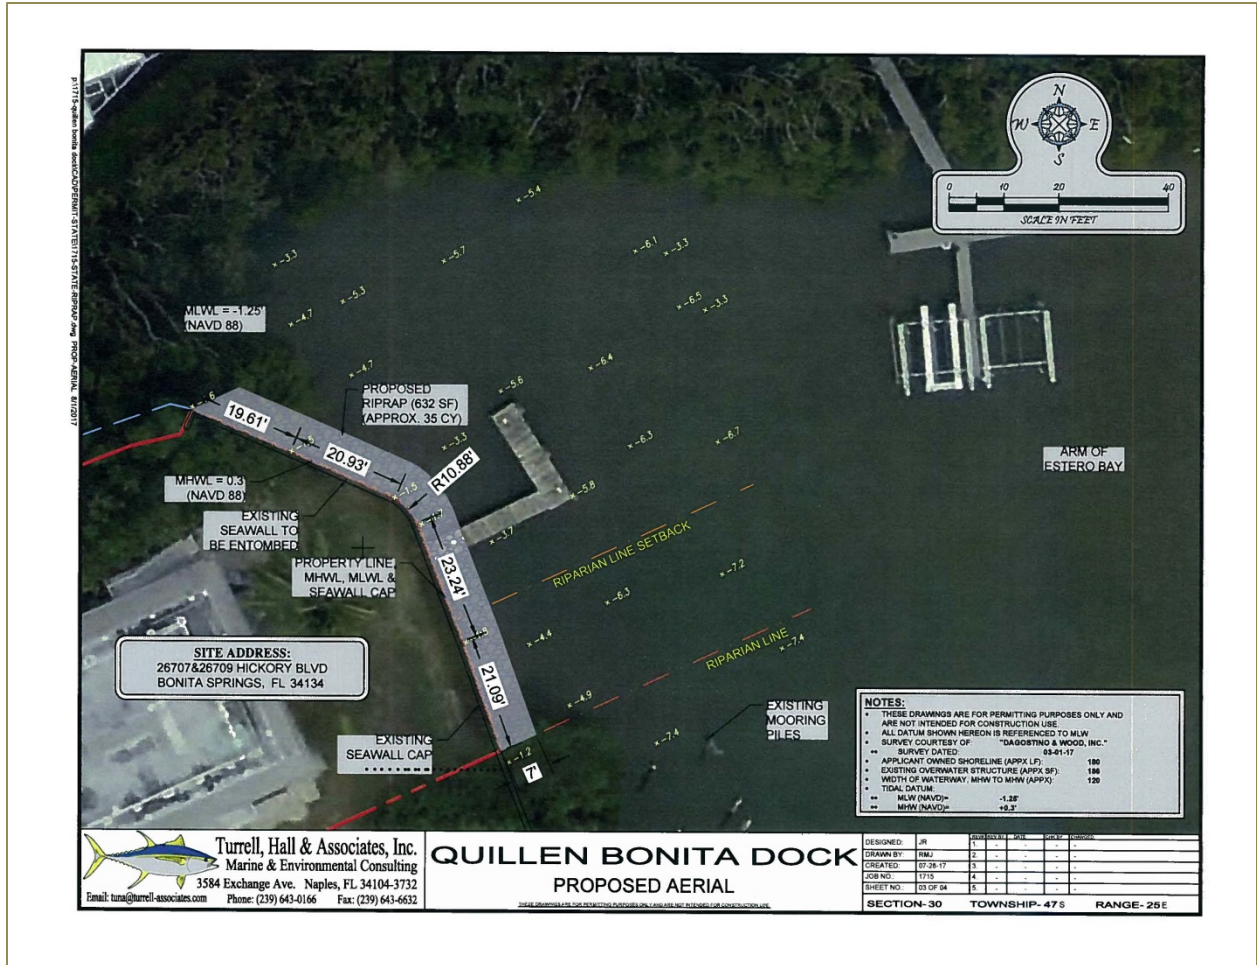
Proposed riprap revetment site plan (©2017 Turrell, Hall & Associates, Inc.)
